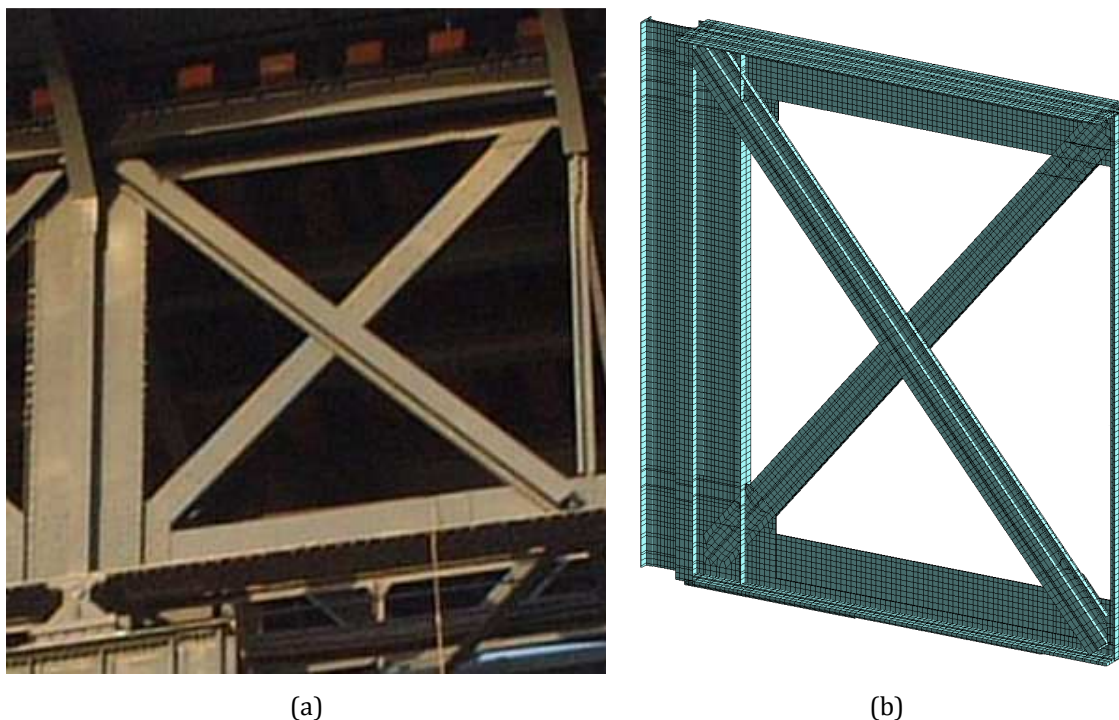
Modeling of the 1st panel of span 11 of the downstream upper deck girder: (a) picture of a typical girder panel; (b) finite elements mesh.
